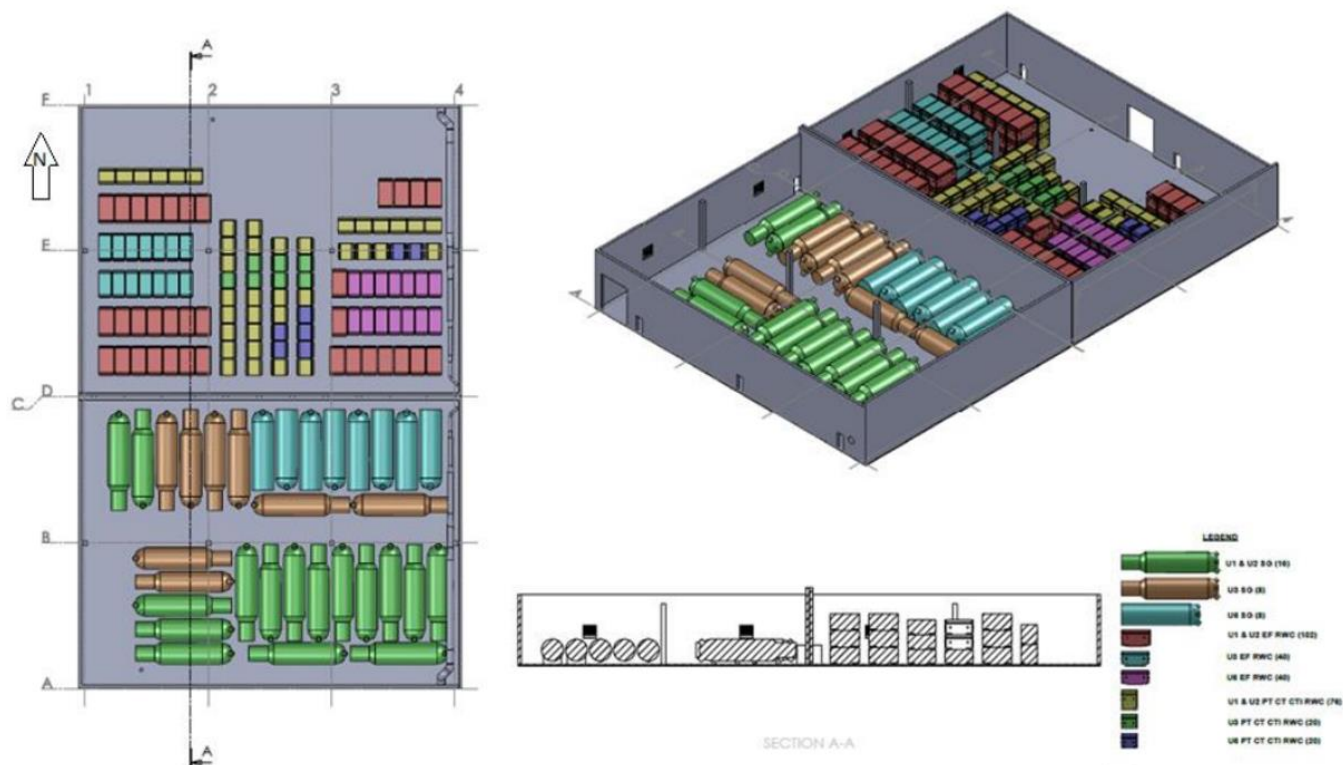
Floor Plan of the Steam Generator Storage Building
